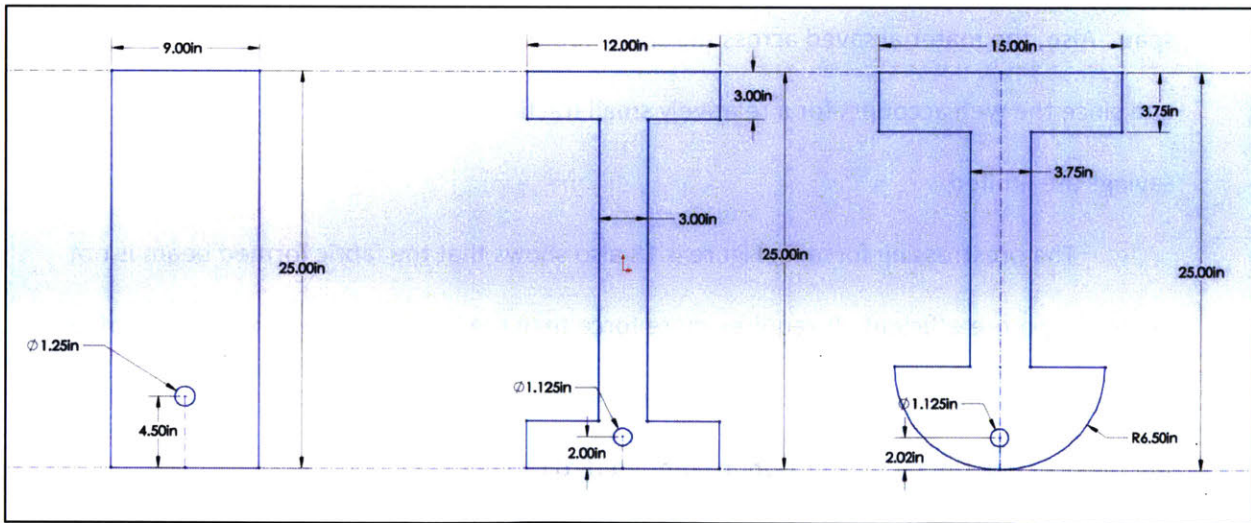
Midspan section for 35 ft. (10.7 m) beam, with section and tendon dimensions.
